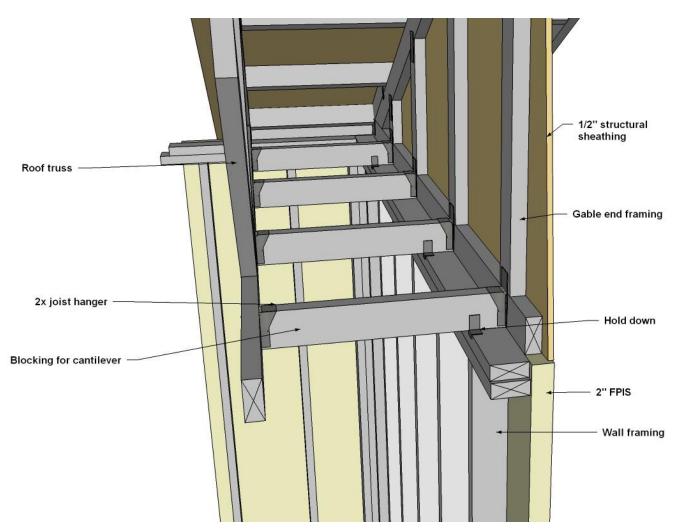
Top of Wall at Gable End with Gable End Frame Sheathed with WSP and Cantilevered Over Wall (Note: Gable bracing is not shown. Contact component manufacturer for load-specific details.)
